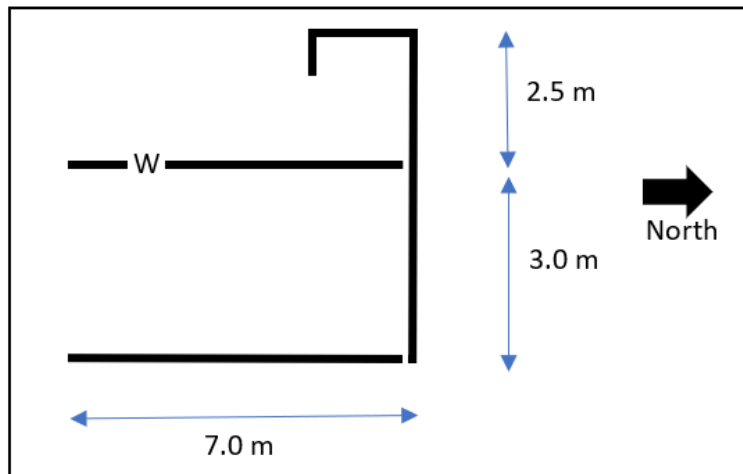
Plan of the ruin at waypoint 158. D = door, W = window.
